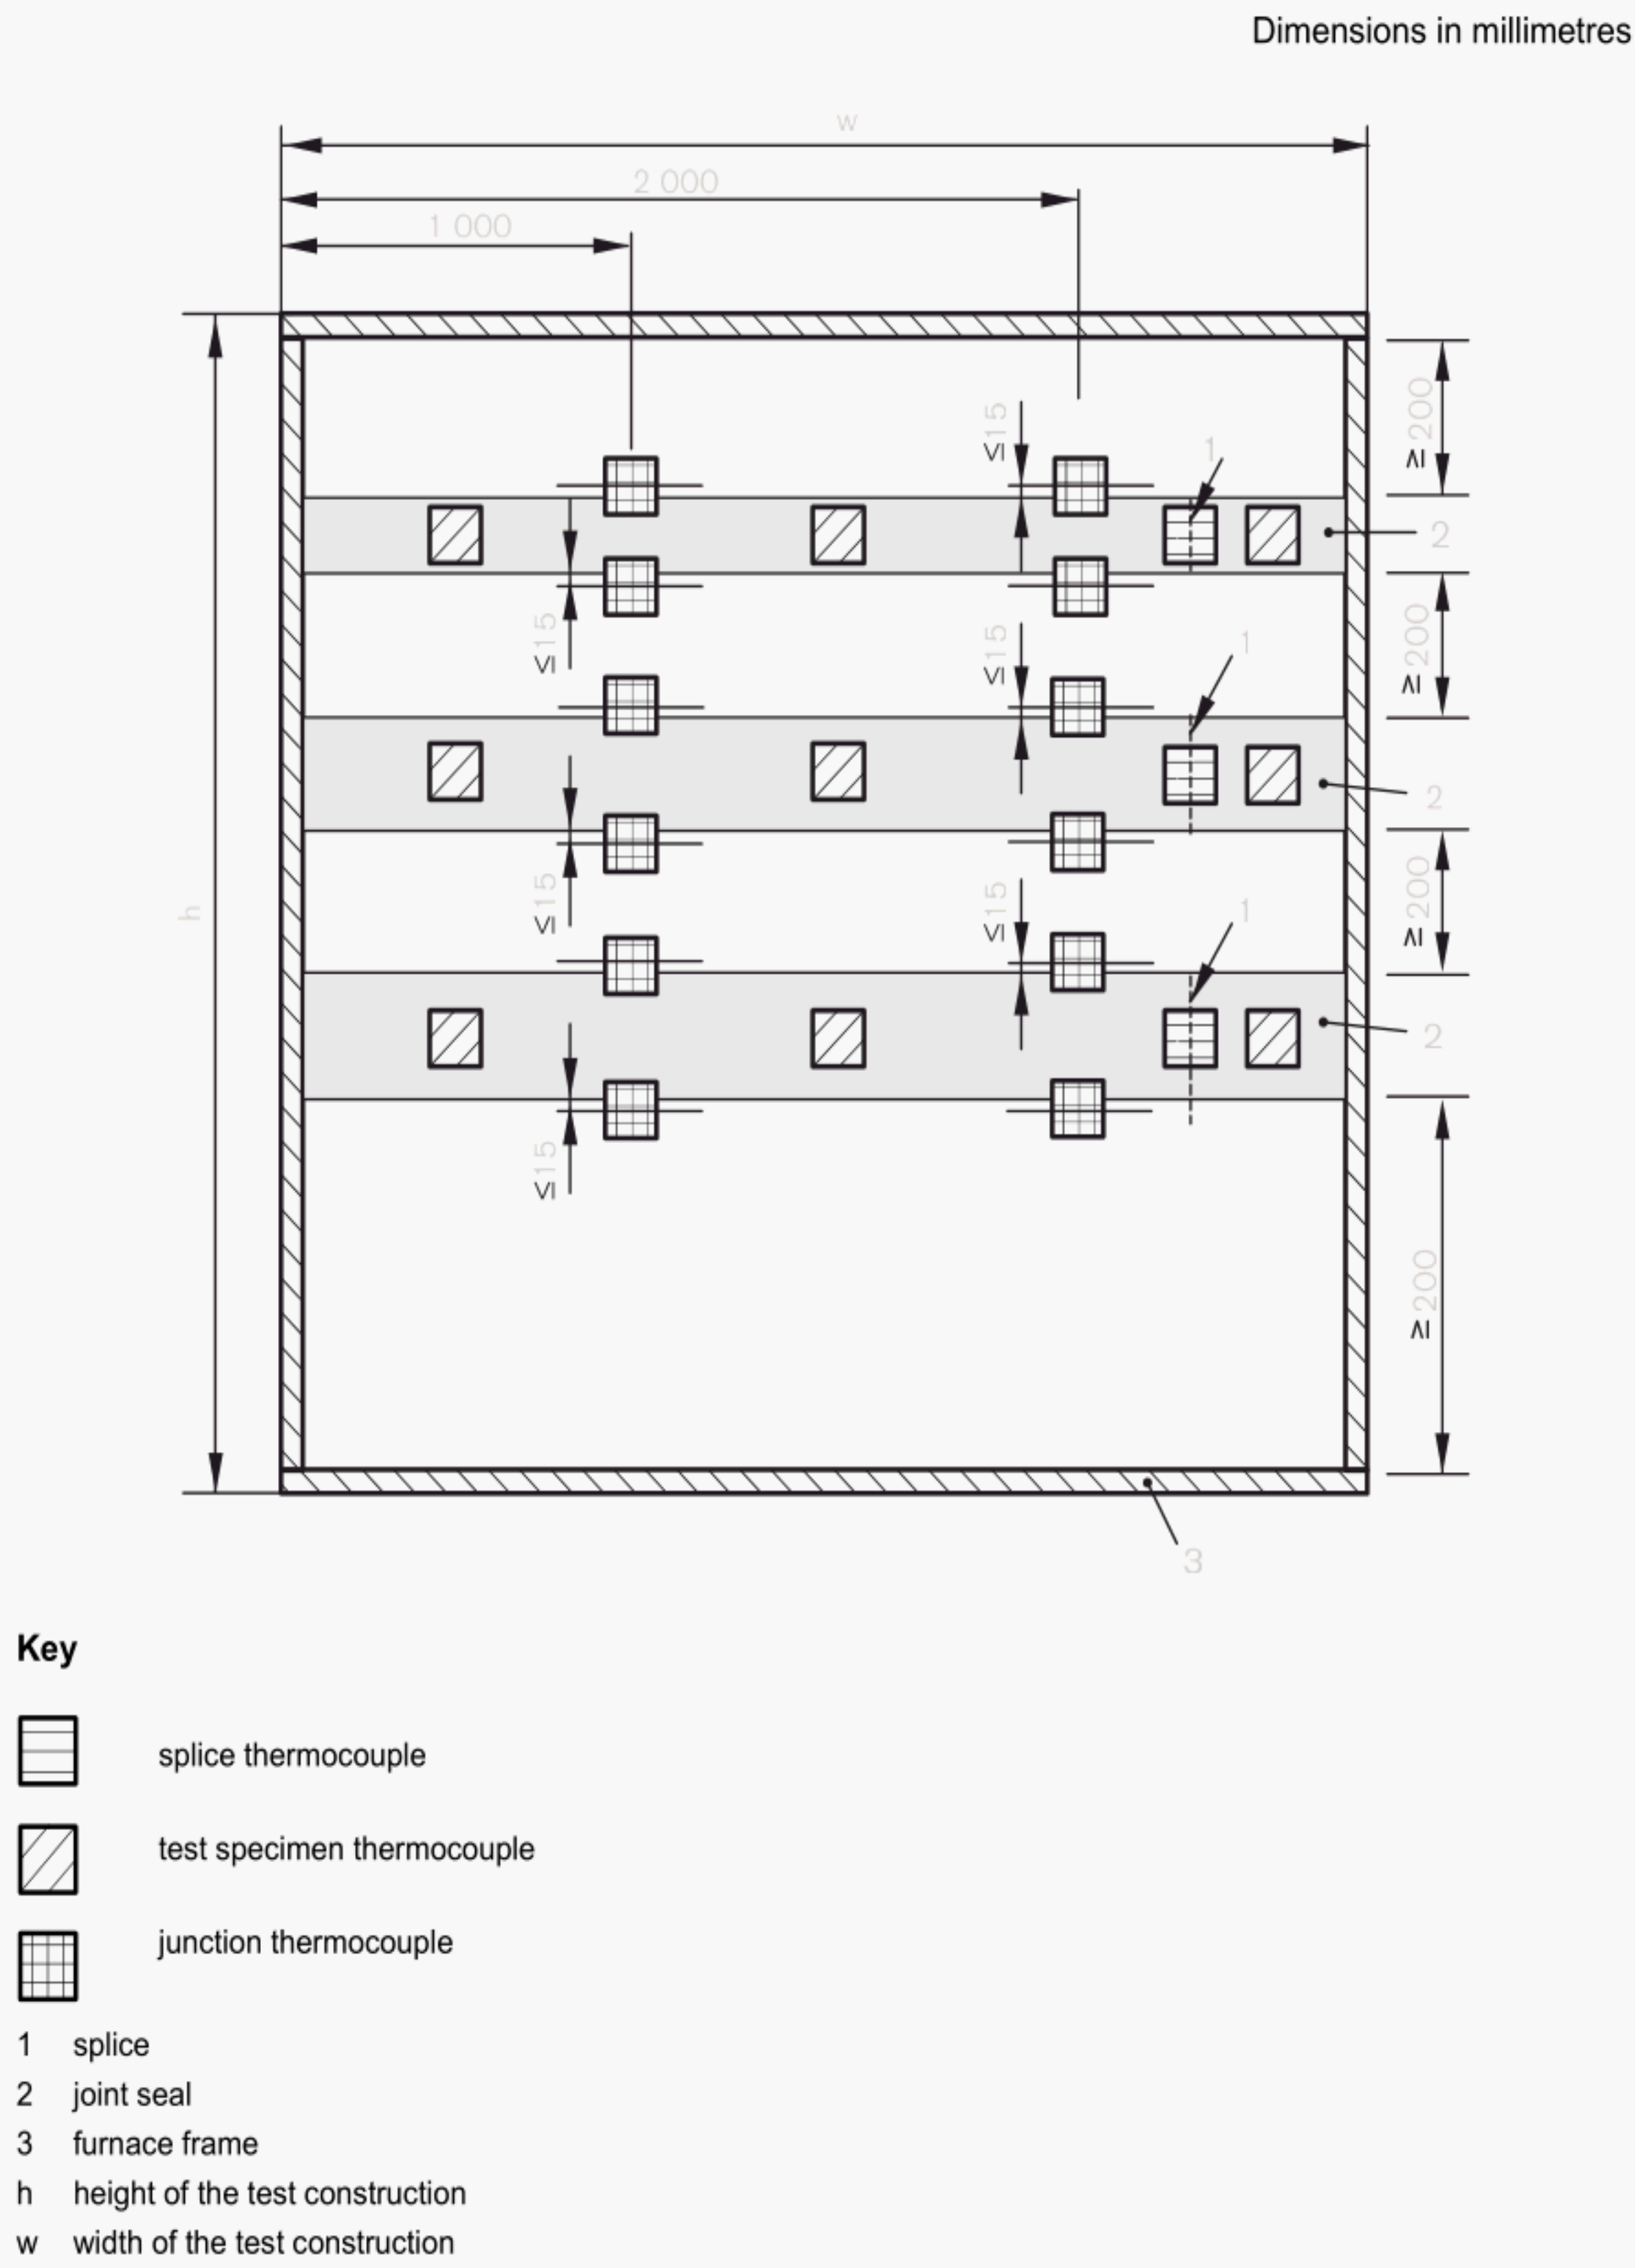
Typical thermocouple layout (full scale vertical furnace, multiple horizontal test specimens)
